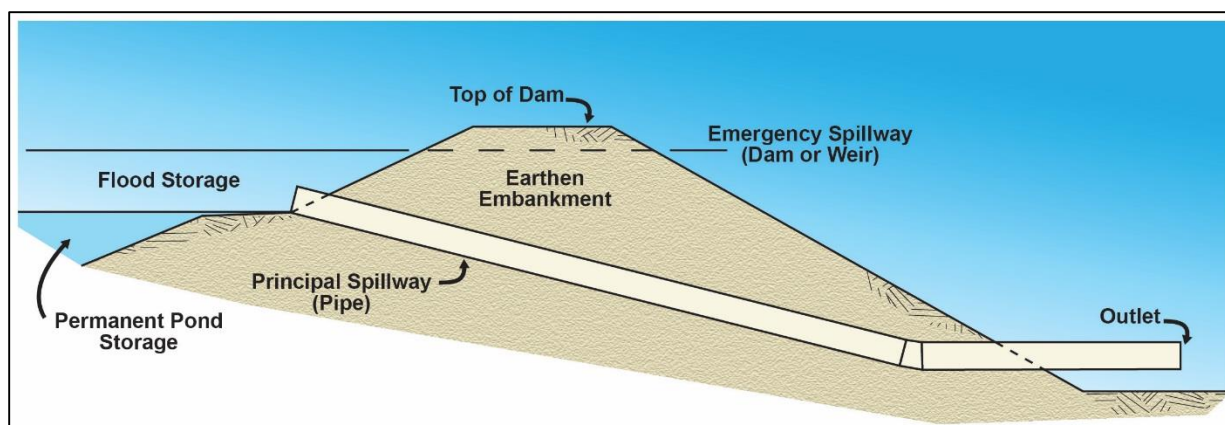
Schematic of a pond constructed to provide flood storage.
